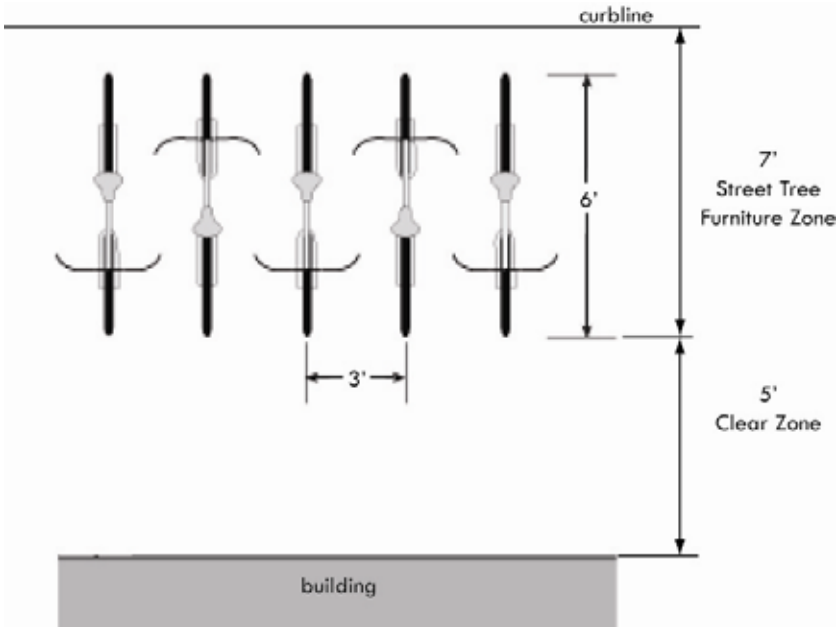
Bicycle parking design – Pedestrian Priority Street sidewalk
